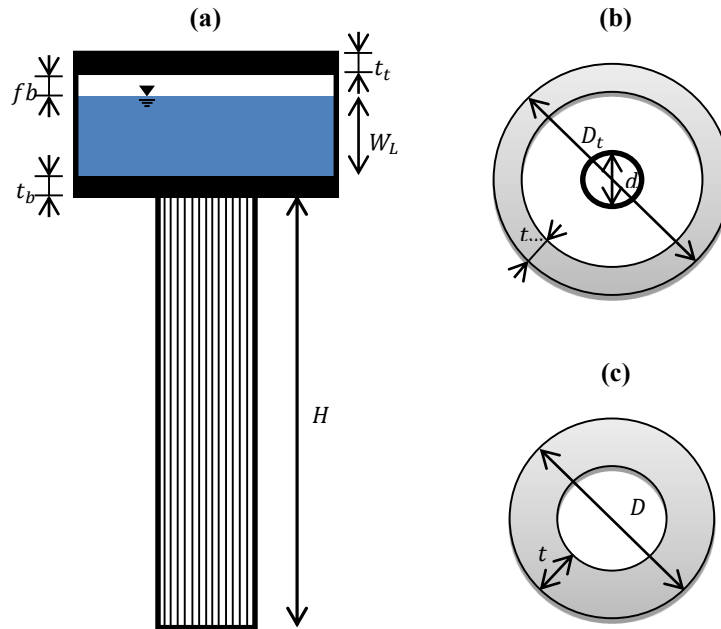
(a) Tank geometry shape; (b) Tank section; (c) Shaft section
